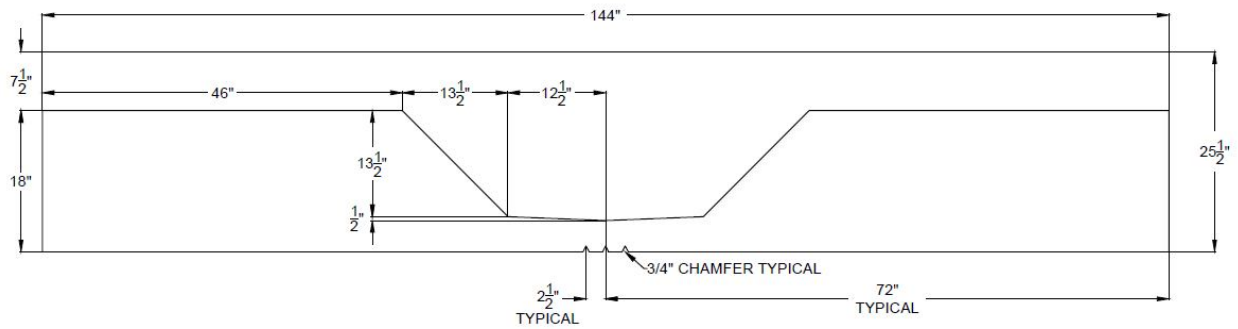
Cross-sectional geometry of No-Connection Connection Test Specimen
